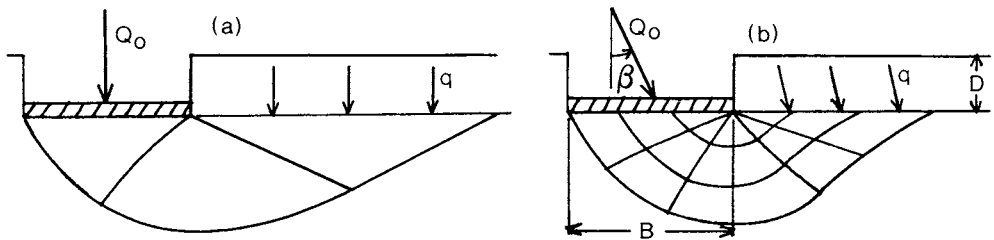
The failure of soil beneath footings with (a) a vertical load and (b) an inclined load.
